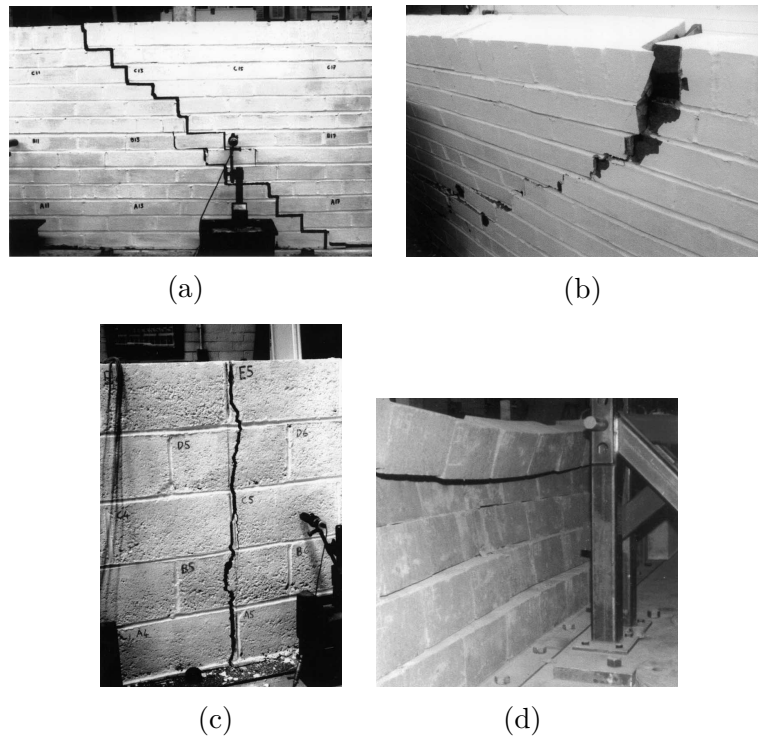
Some structural failure modes of masonry subjected to impacts. Credit: Gilbert et al. (2002).
